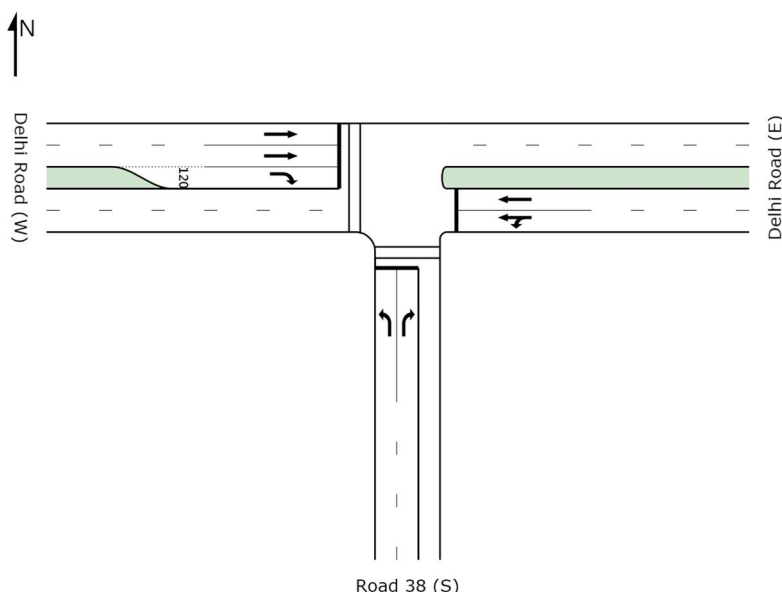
Proposed layout of intersection of Delhi Road and Road 38
